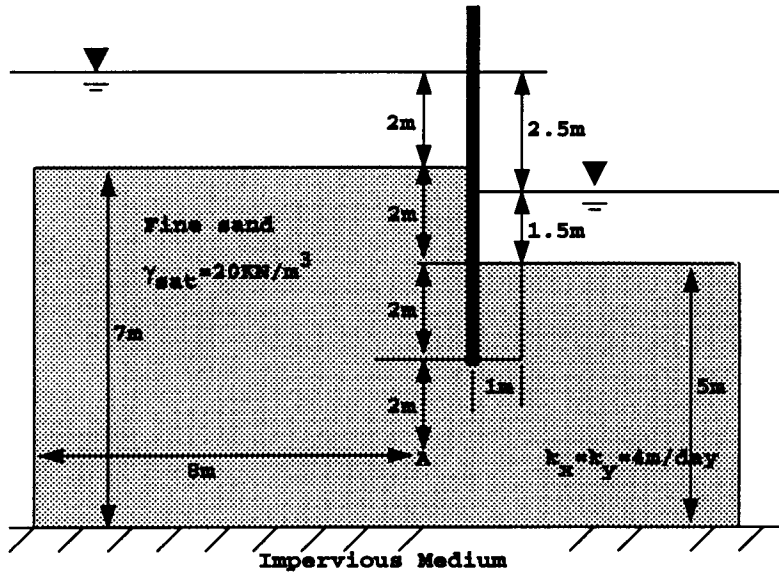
Steady seepage under a sheet-pile cutoff wall.
